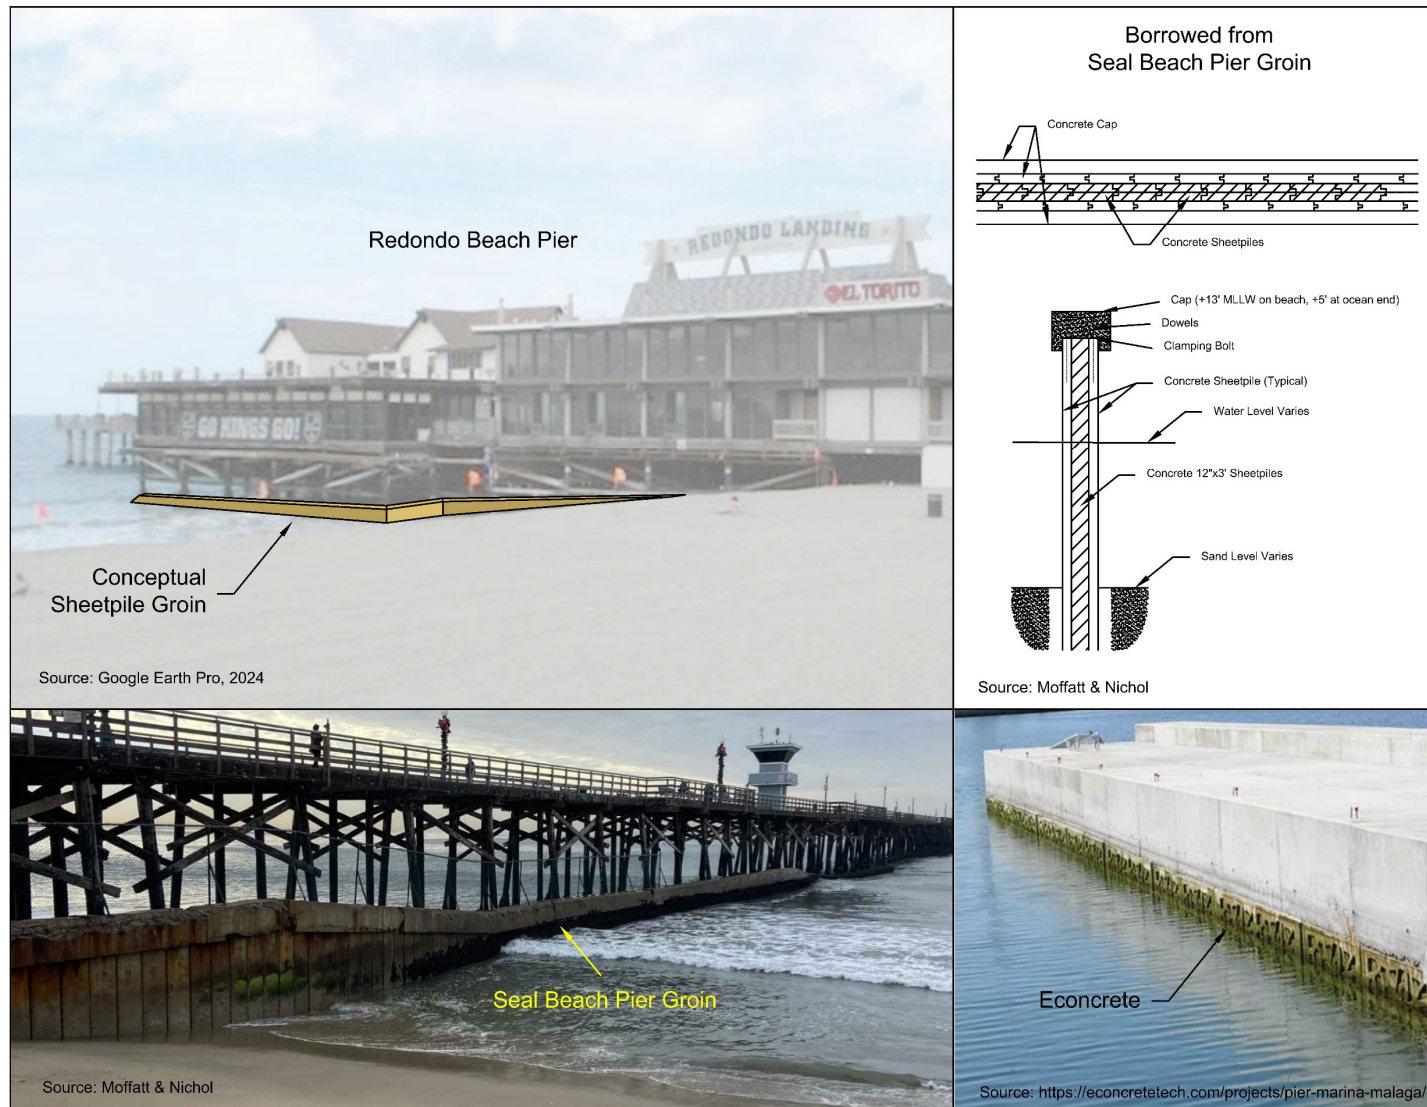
Conceptual Illustration of Proposed Sheet Pile Groin, Seal Beach Pier Groin, and EConcrete Finish
